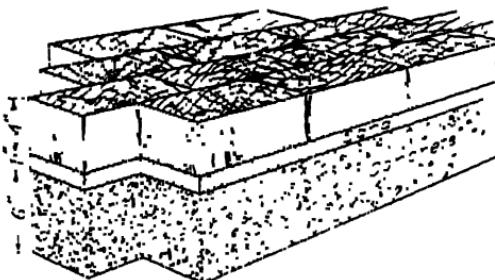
Section Showing Foundation for Wood-Block Pavements and Method of Laying Blocks
